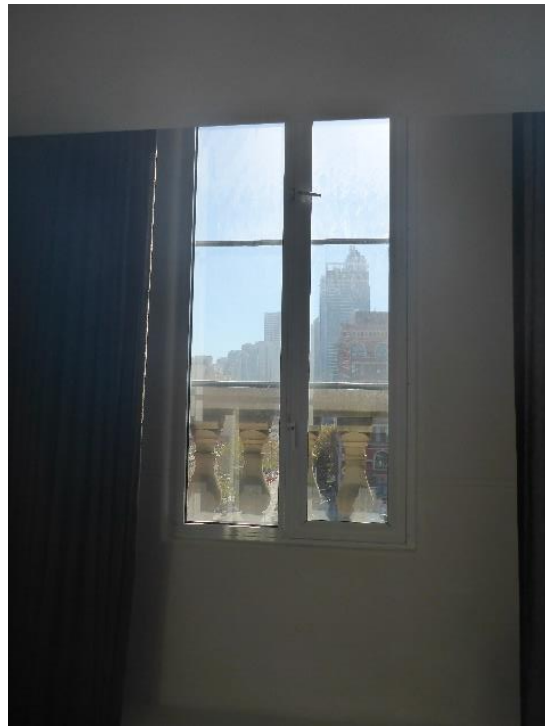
View of window with internal sound insulation (double glazing) and balusters beyond
